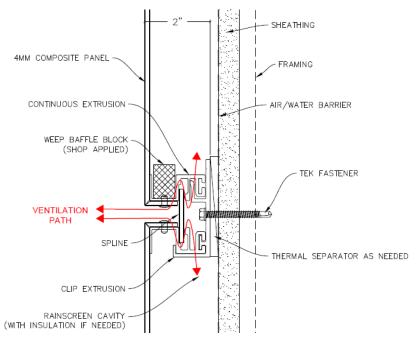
Typical horizontal joint detail for D/BV rainscreen panel system
